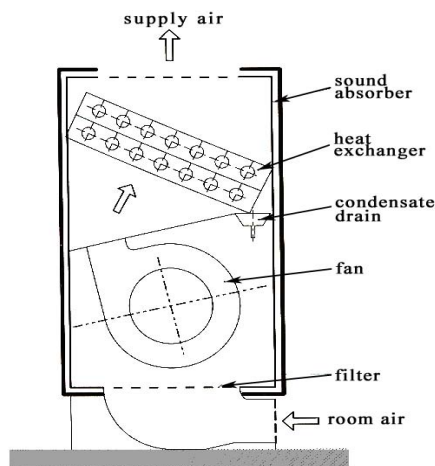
Cross section of a typical simple fan-coil unit with one heat exchanger for air cooling.
